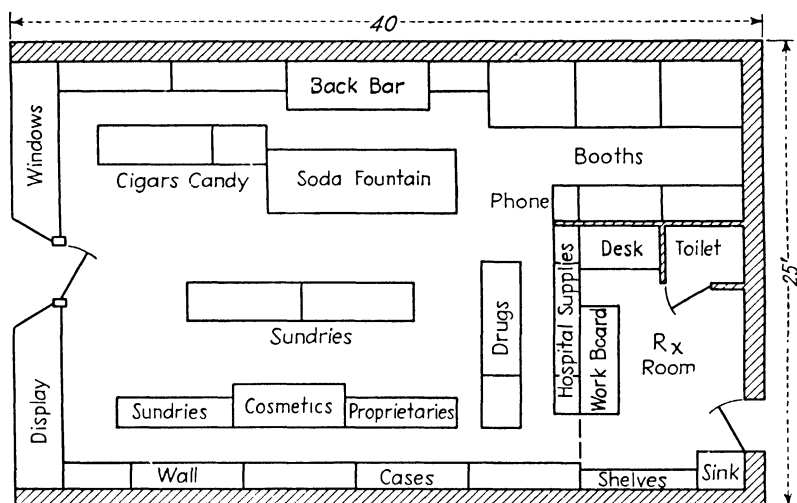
Floor plan of a short wide drug store (Wilson Drug Company, Idaho Falls, Idaho). (Figure made from a floor plan of the Midwestern Fixture Corp.)
